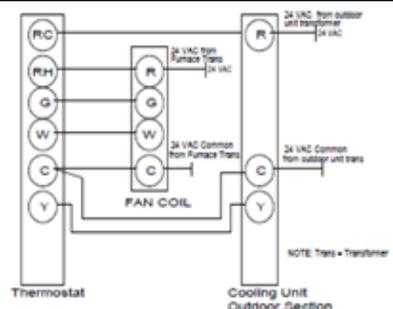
Heat/Cool Thermostat Connections - Single Thermostat & Separate Transformers in Air Handler & Outdoor Unit
